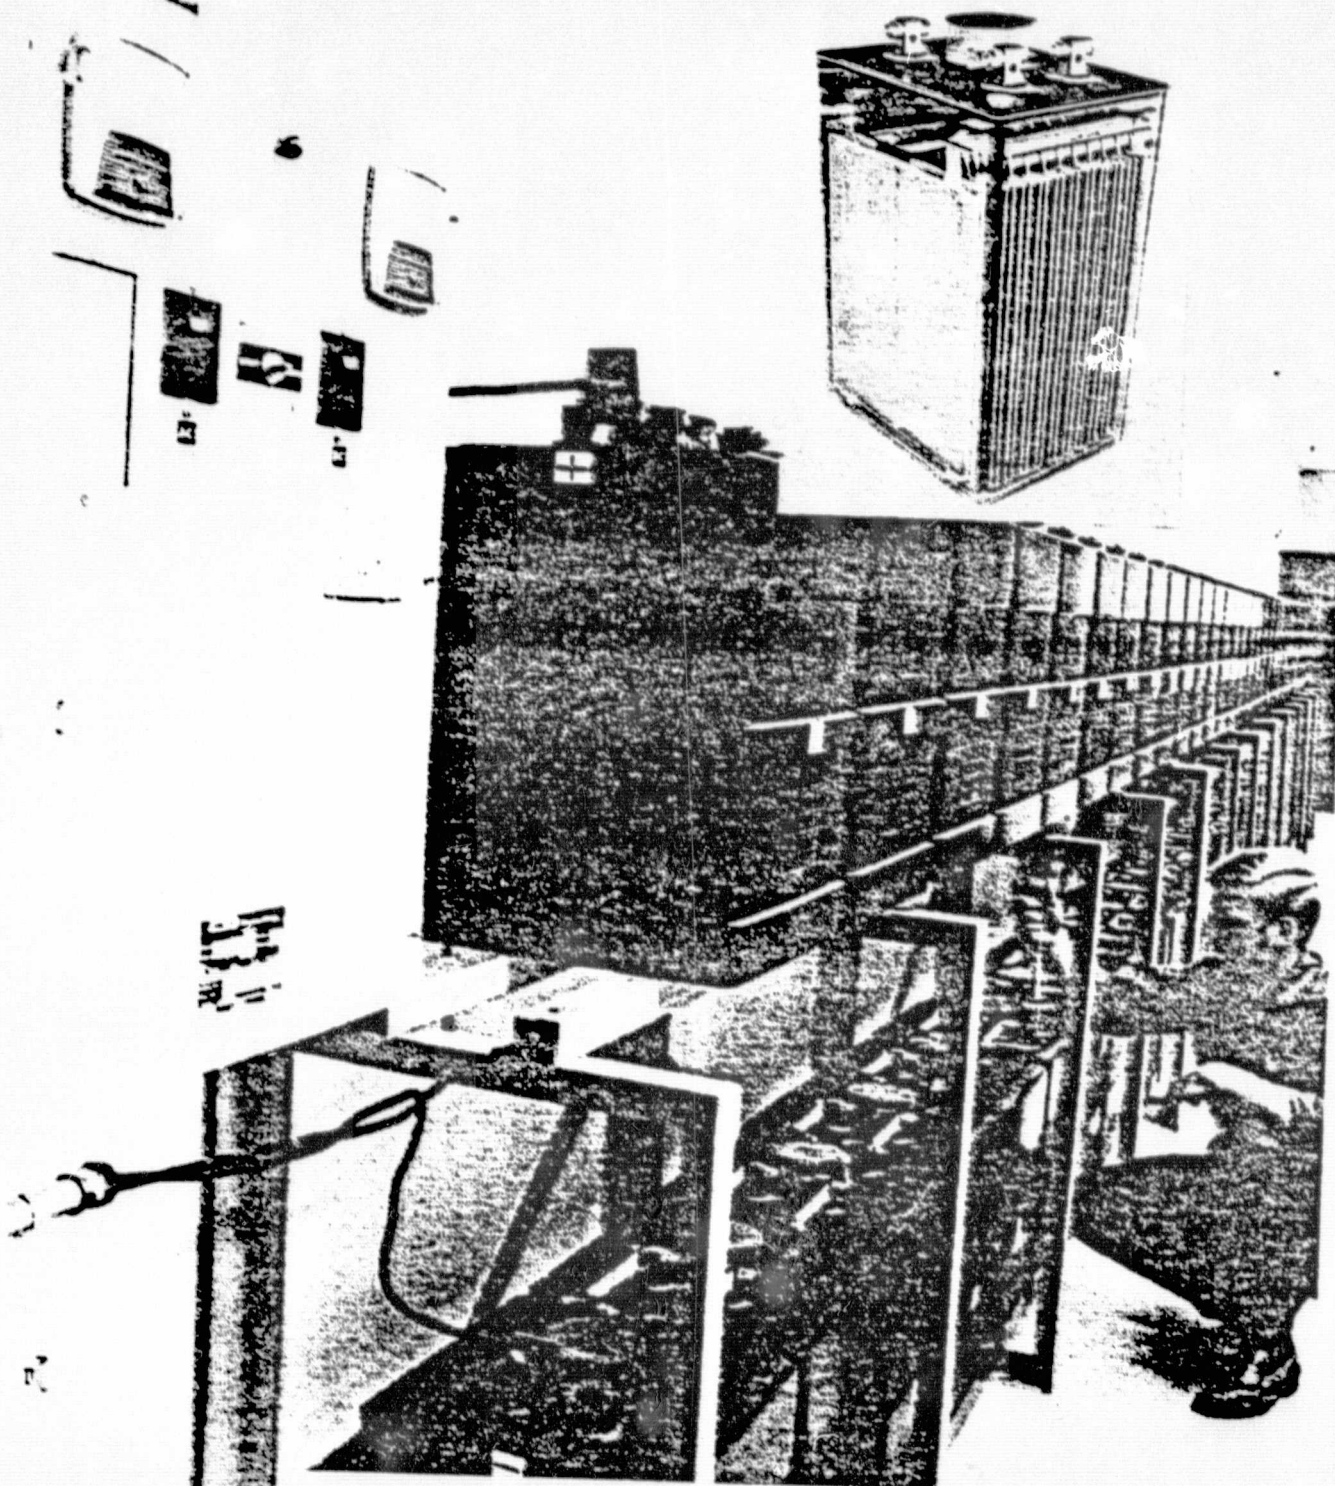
TYPICAL BATTERY INSTALLATION
